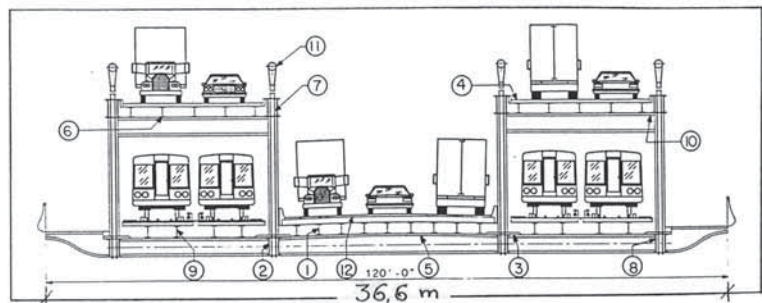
CROSS SECTION OF MANHATTAN BRIDGE, NEW YORK - Major Defects Reported
